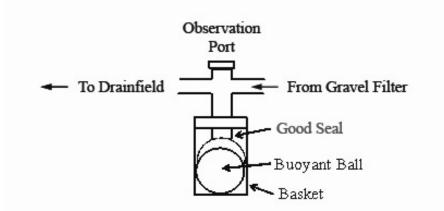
Typical Cross-section Of A Buoyant-ball Check Valve
